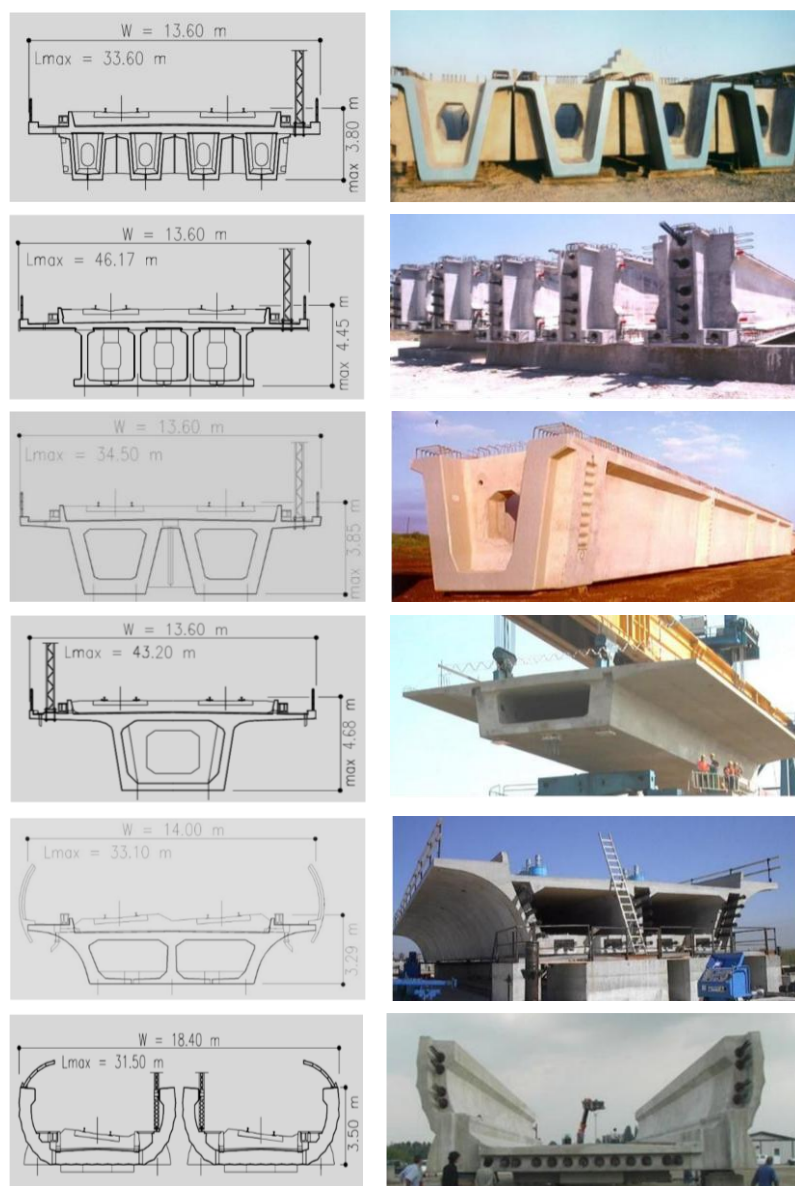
From top to bottom - 4 parallel box girder, beam girder, 2 parallel box girder, single cell box girder, two-cell box girder, through deck
